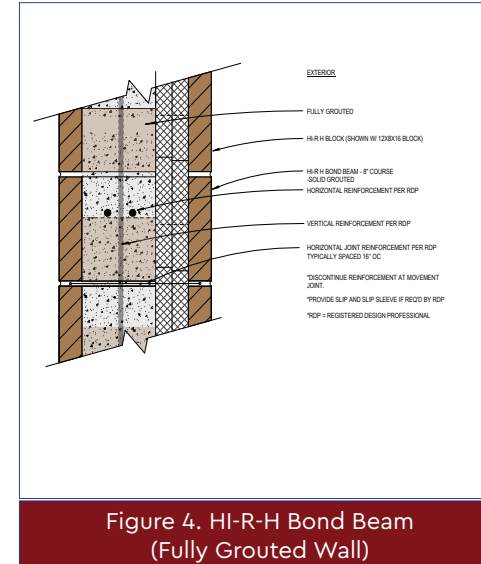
HI-R-H Bond Beam (Fully Grouted Wall)
